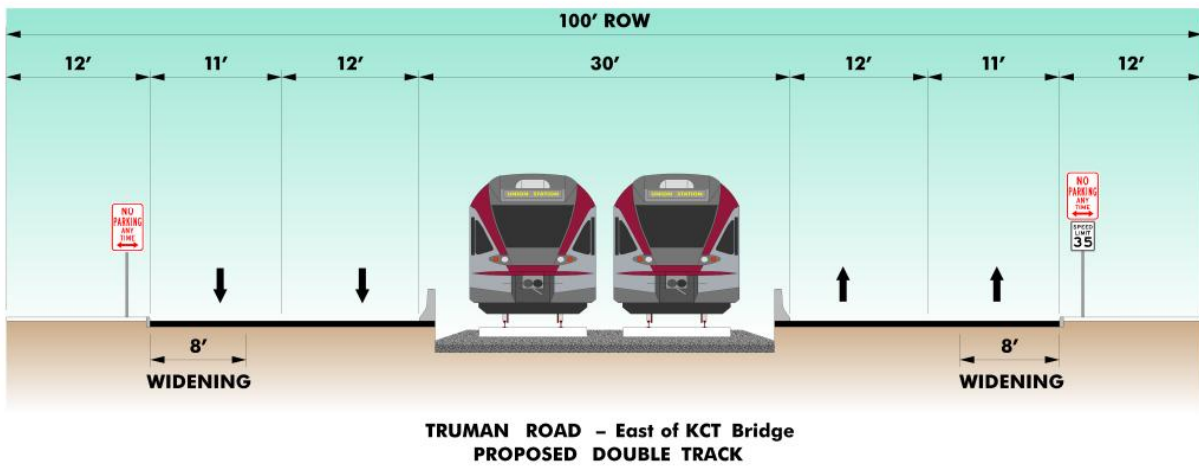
Regional Rail Typical Section on Truman Road - East of KCT Bridge
